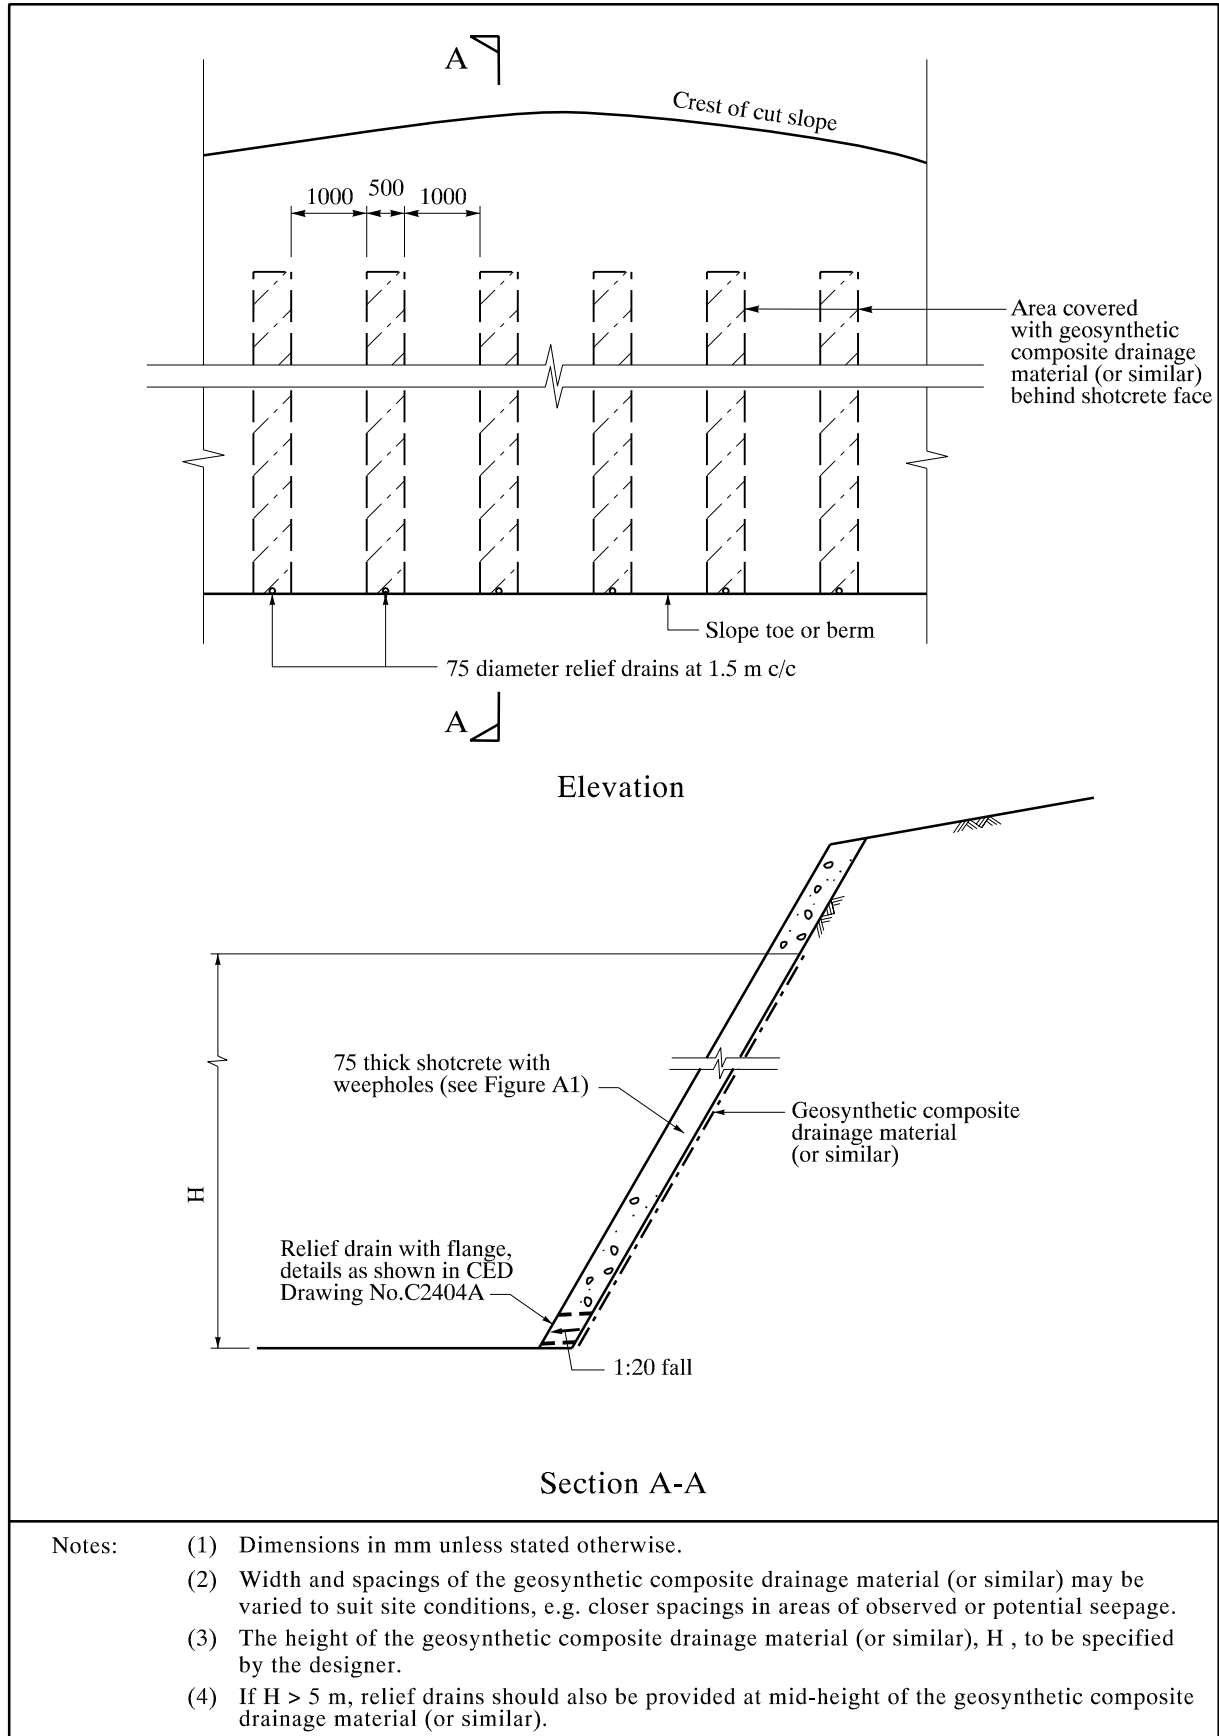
Drainage behind Impermeable Slope Surface Cover (with Relief Drains)
